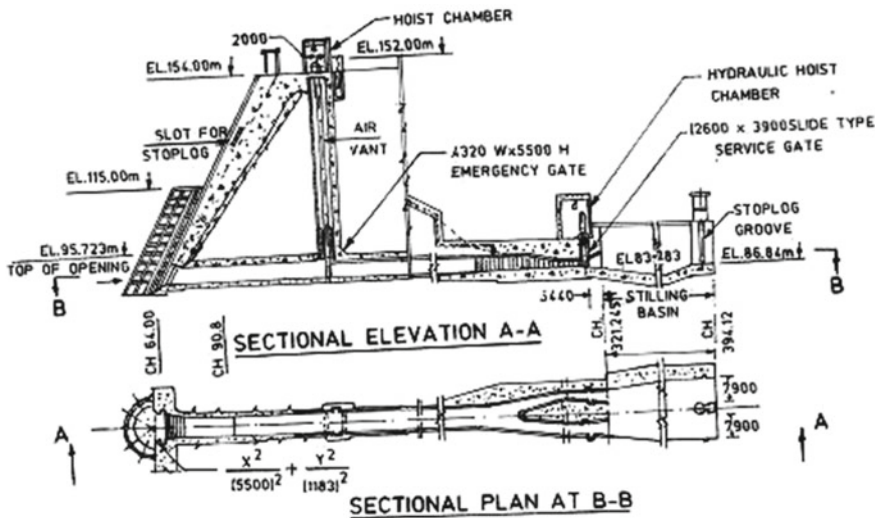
Sectional plan of irrigation by-pass tunnel system
